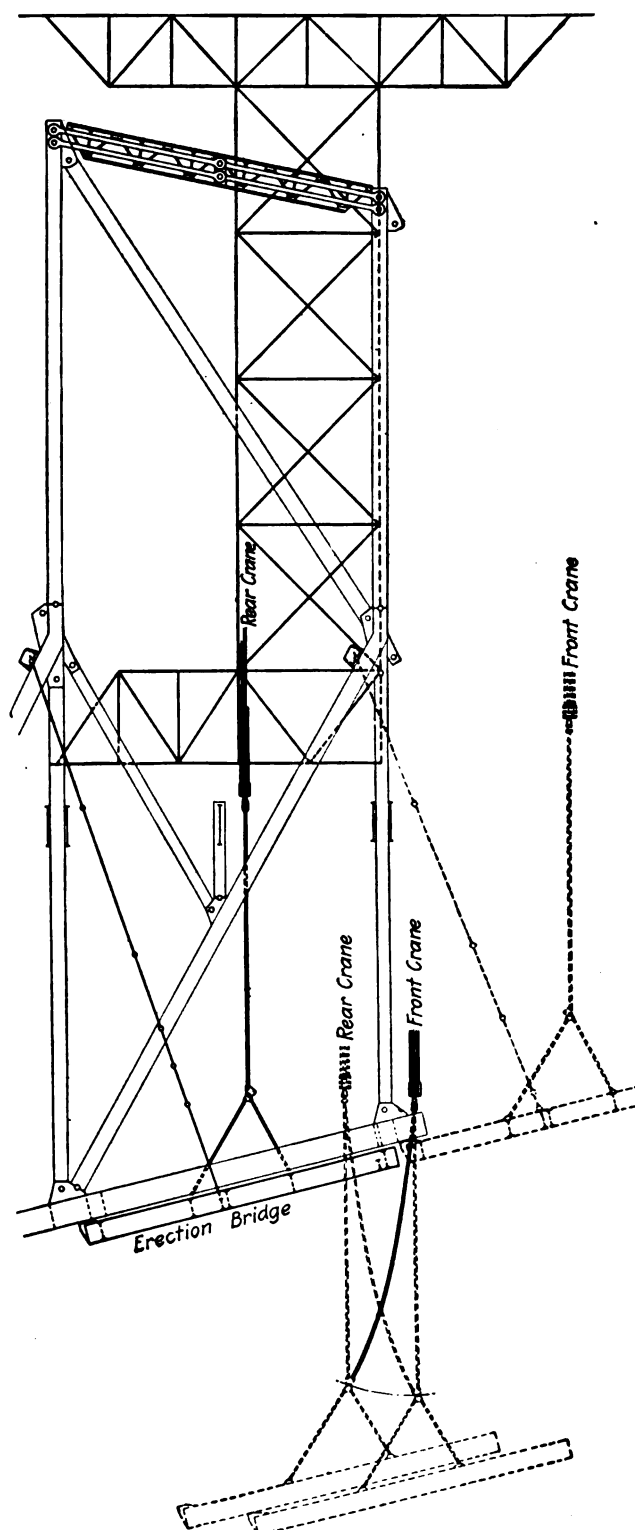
TRAVELER CRANES HANDLING ERECTION BRIDGE
